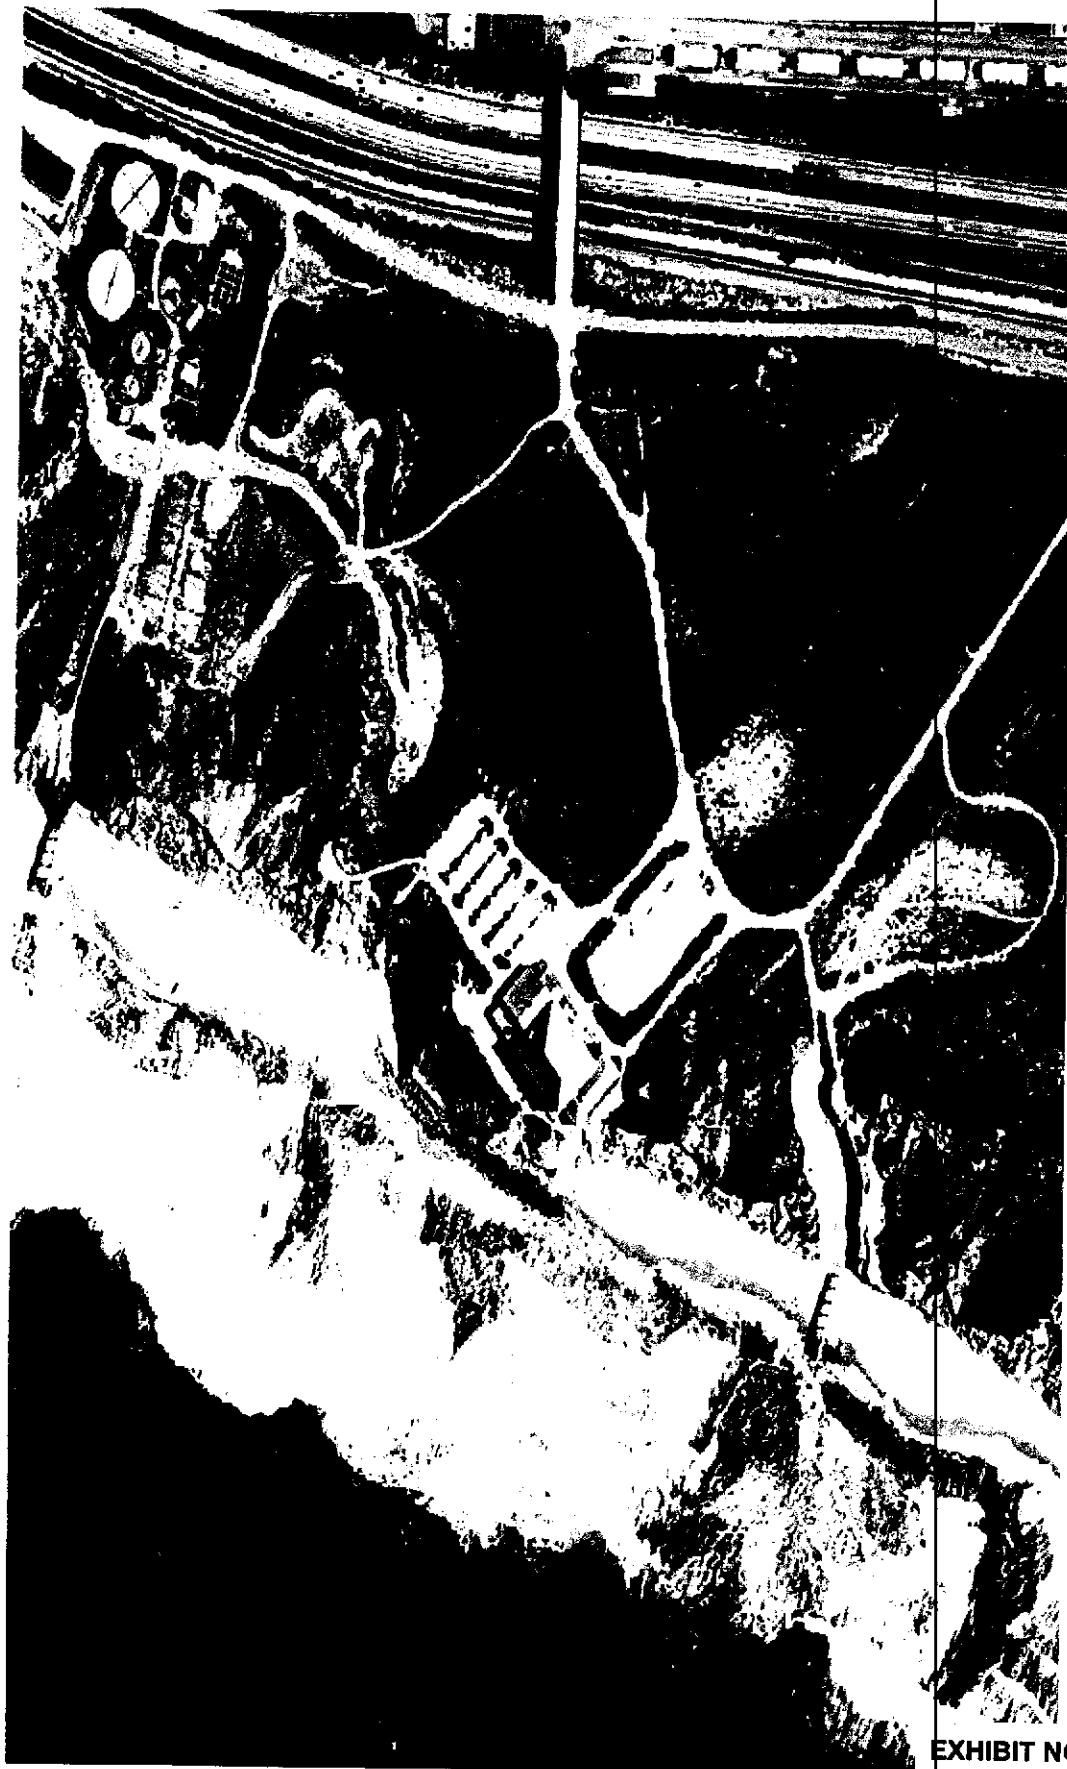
Aerial photo showing Stilwell Hall and extent of rock riprap.
